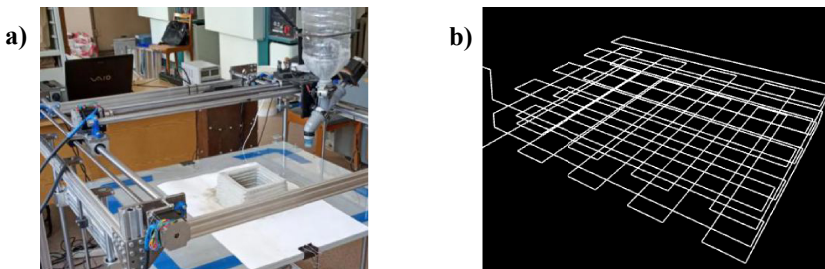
Laboratory building printer for contour crafting (a); Model diagram for printing (b).
